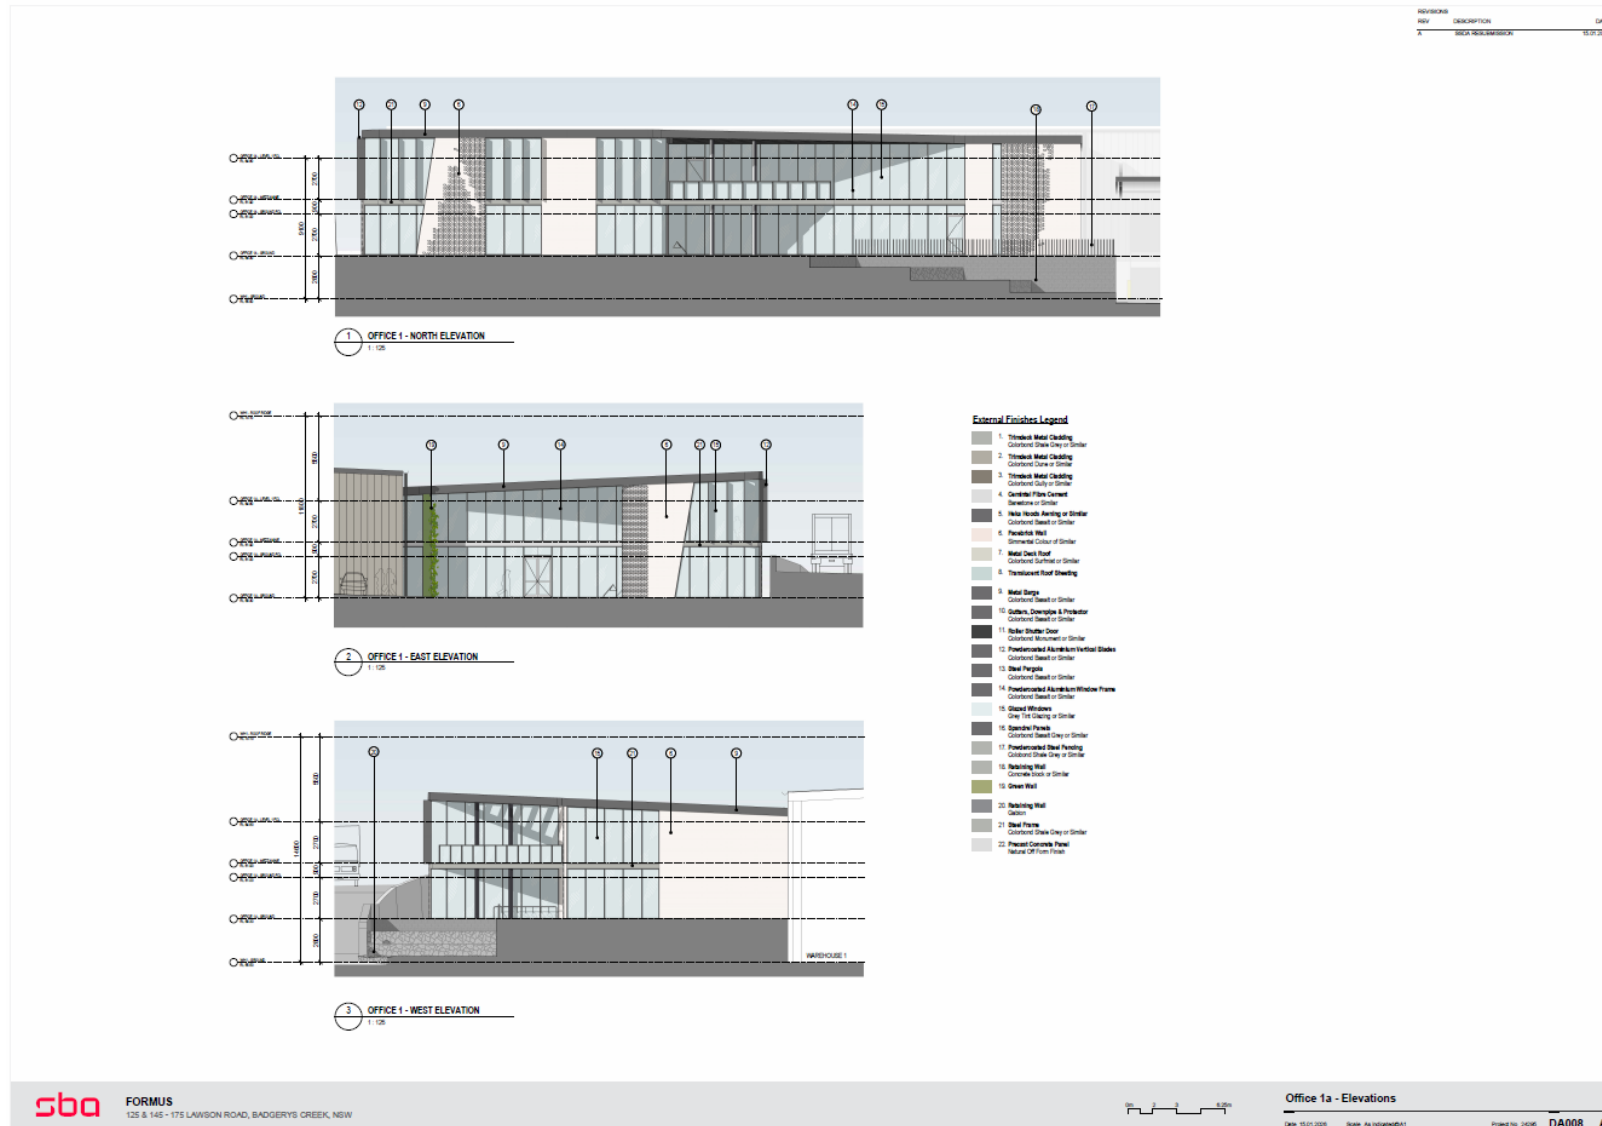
Extract of proposed architectural drawings showing the elevations for Office 1a.
